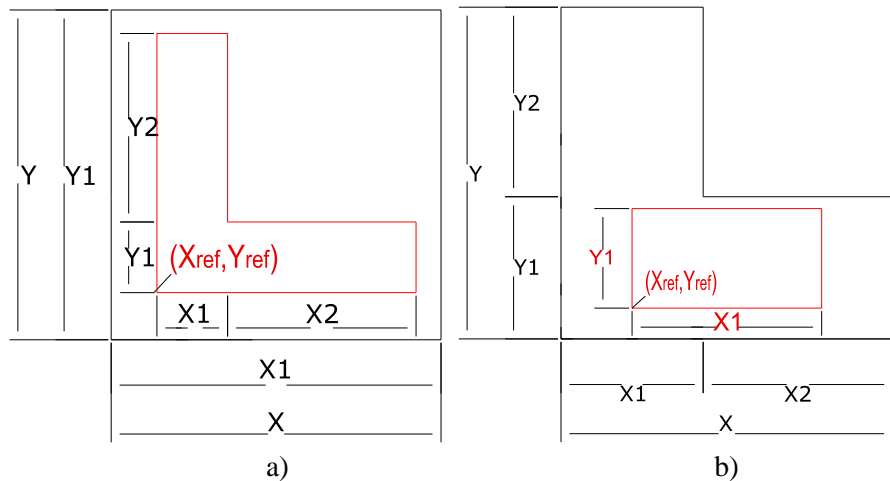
Variable floor plan types with a) a rectangular base and b) a L-shaped base
